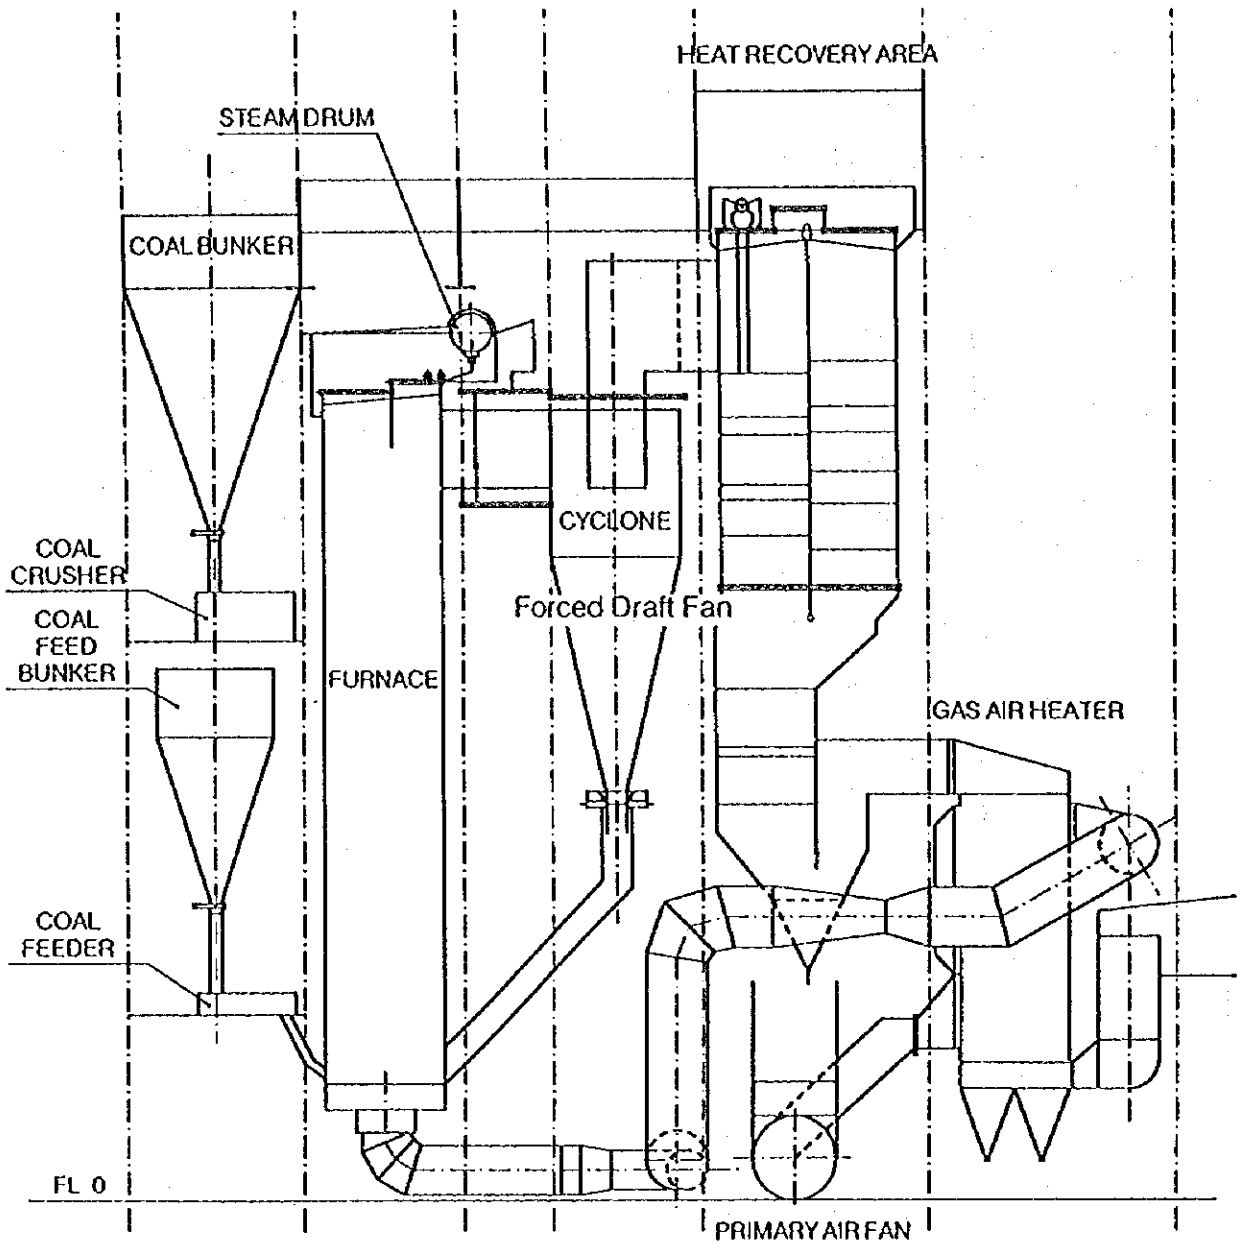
SIDE VIEW OF C-FBC BOILER PLANT
